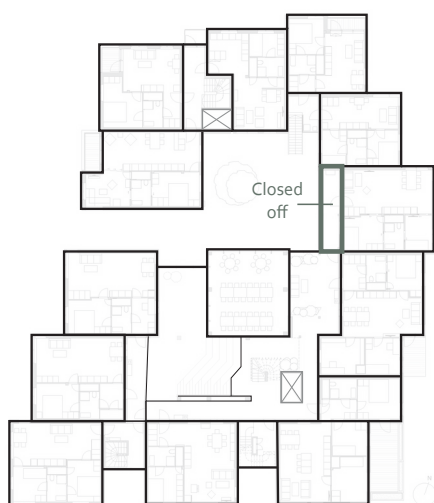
Dwellings situated around central heart (made by author, based on ArchDaily, 2021)
